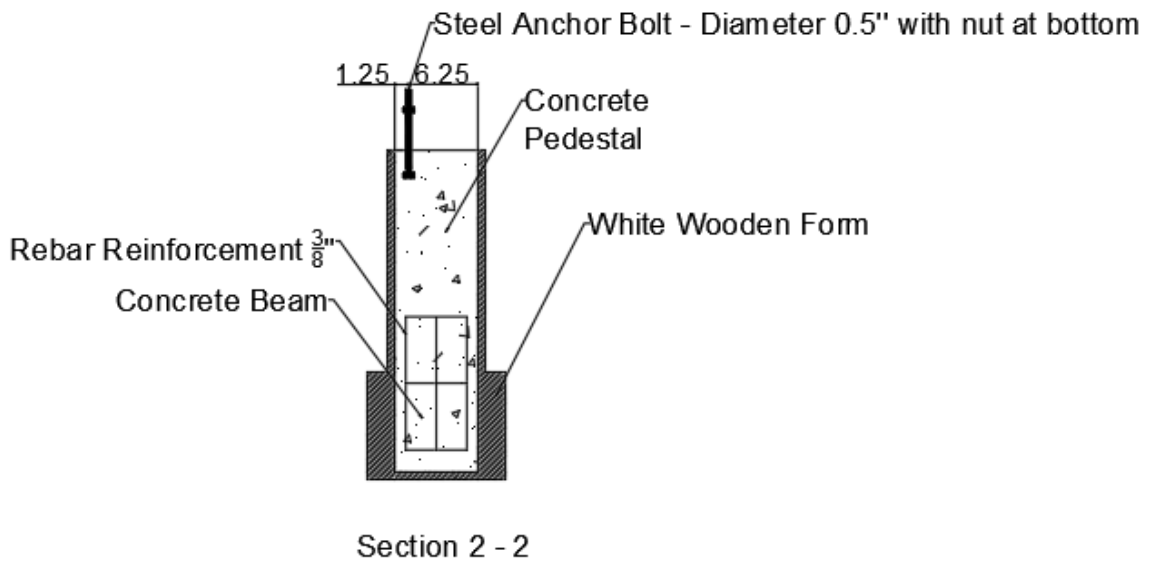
Specimen Sections (2-2), all dimensions in inch.
